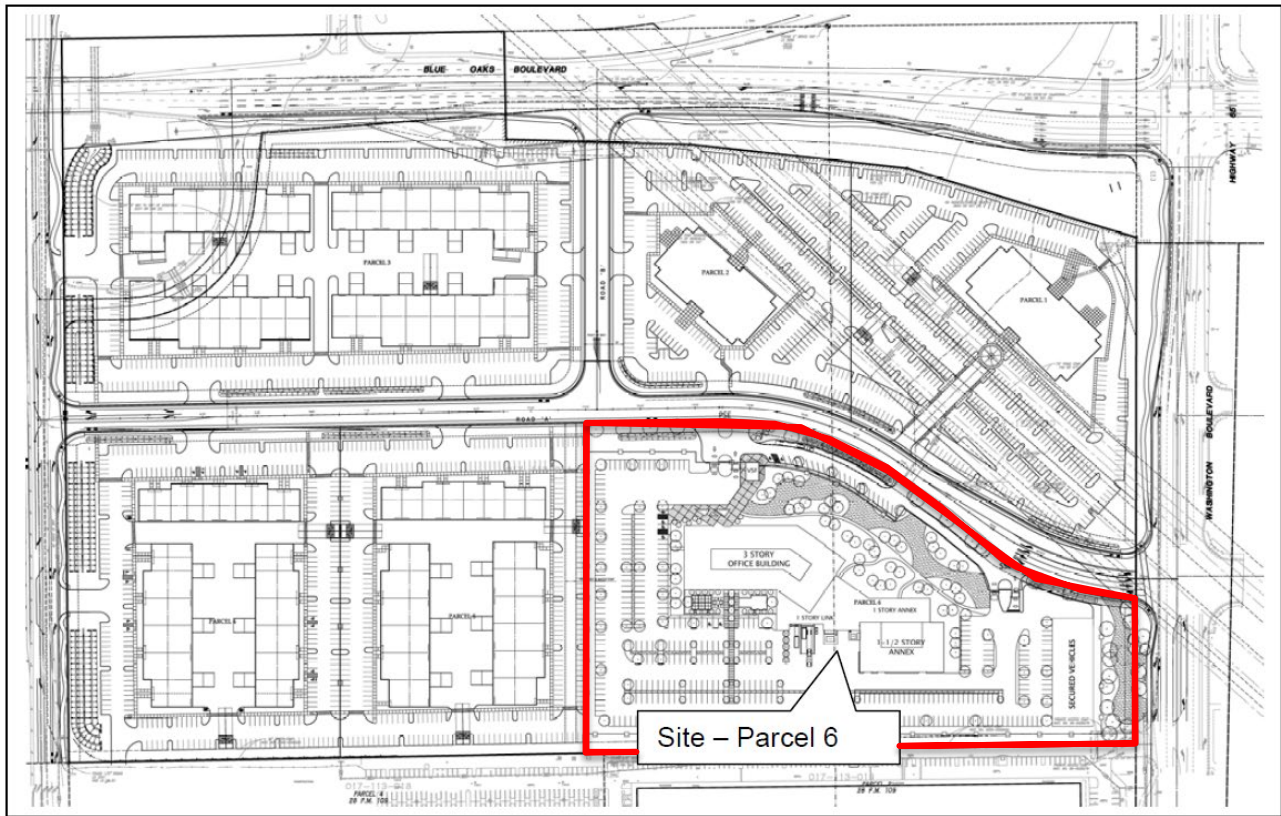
Approved Blue Oaks Commerce Center Site Plan (File# 2007PL-039)
